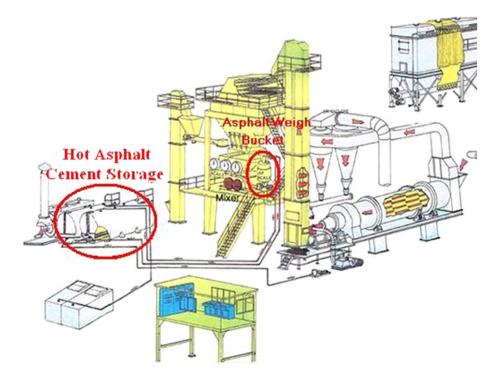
Schematic of passible places for adding additives to the asphalt binder in asphalt plants.
